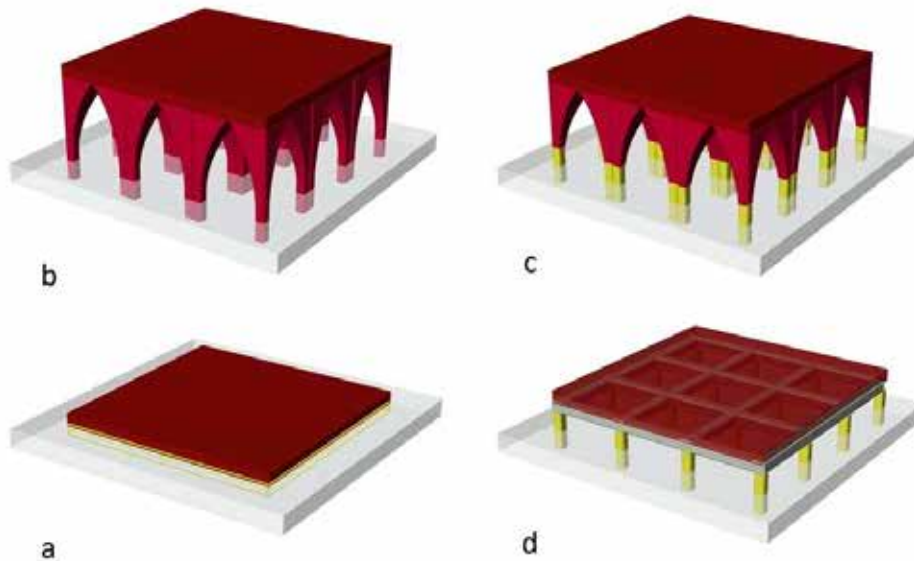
Solutions for the foundation: a) floating 3d printed slab on ground, b) slab on 3D printed concrete grounding on piles in the same material, c) slab on 3D printed concrete grounding on piles in other material (wood or steel), and d) concrete slab 3D printed on cable grid structure.
